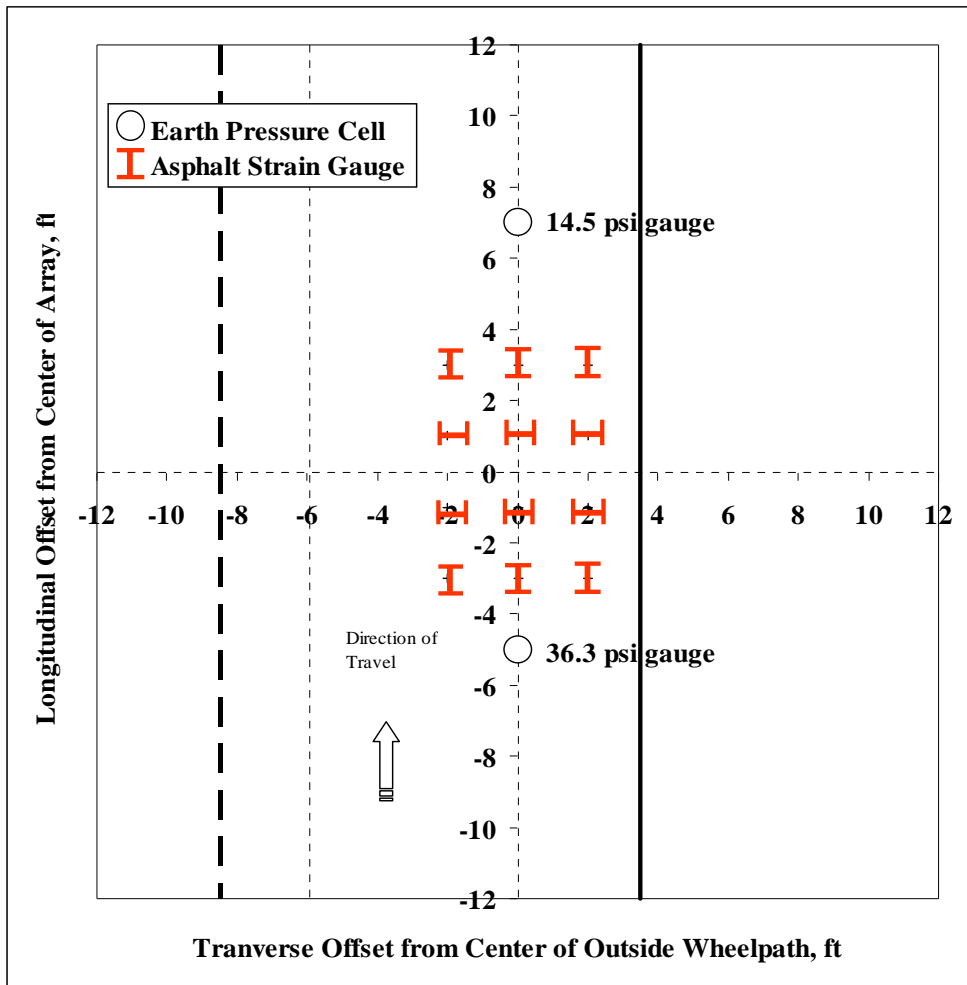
Structural Experiment Sections Instrumentation Layout.
